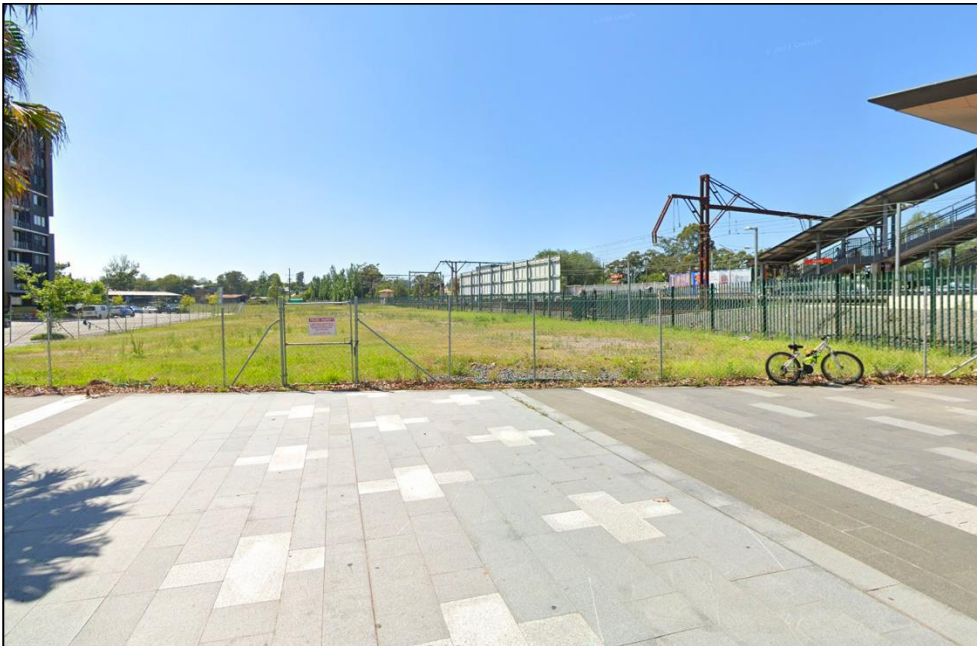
Looking towards the site from the west, adjacent to Penrith Station.
